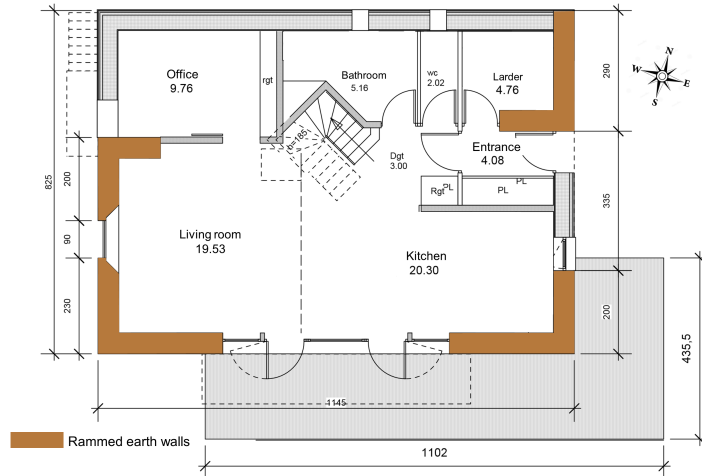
Home plan for the ground floor, with the four rammed earth walls.
